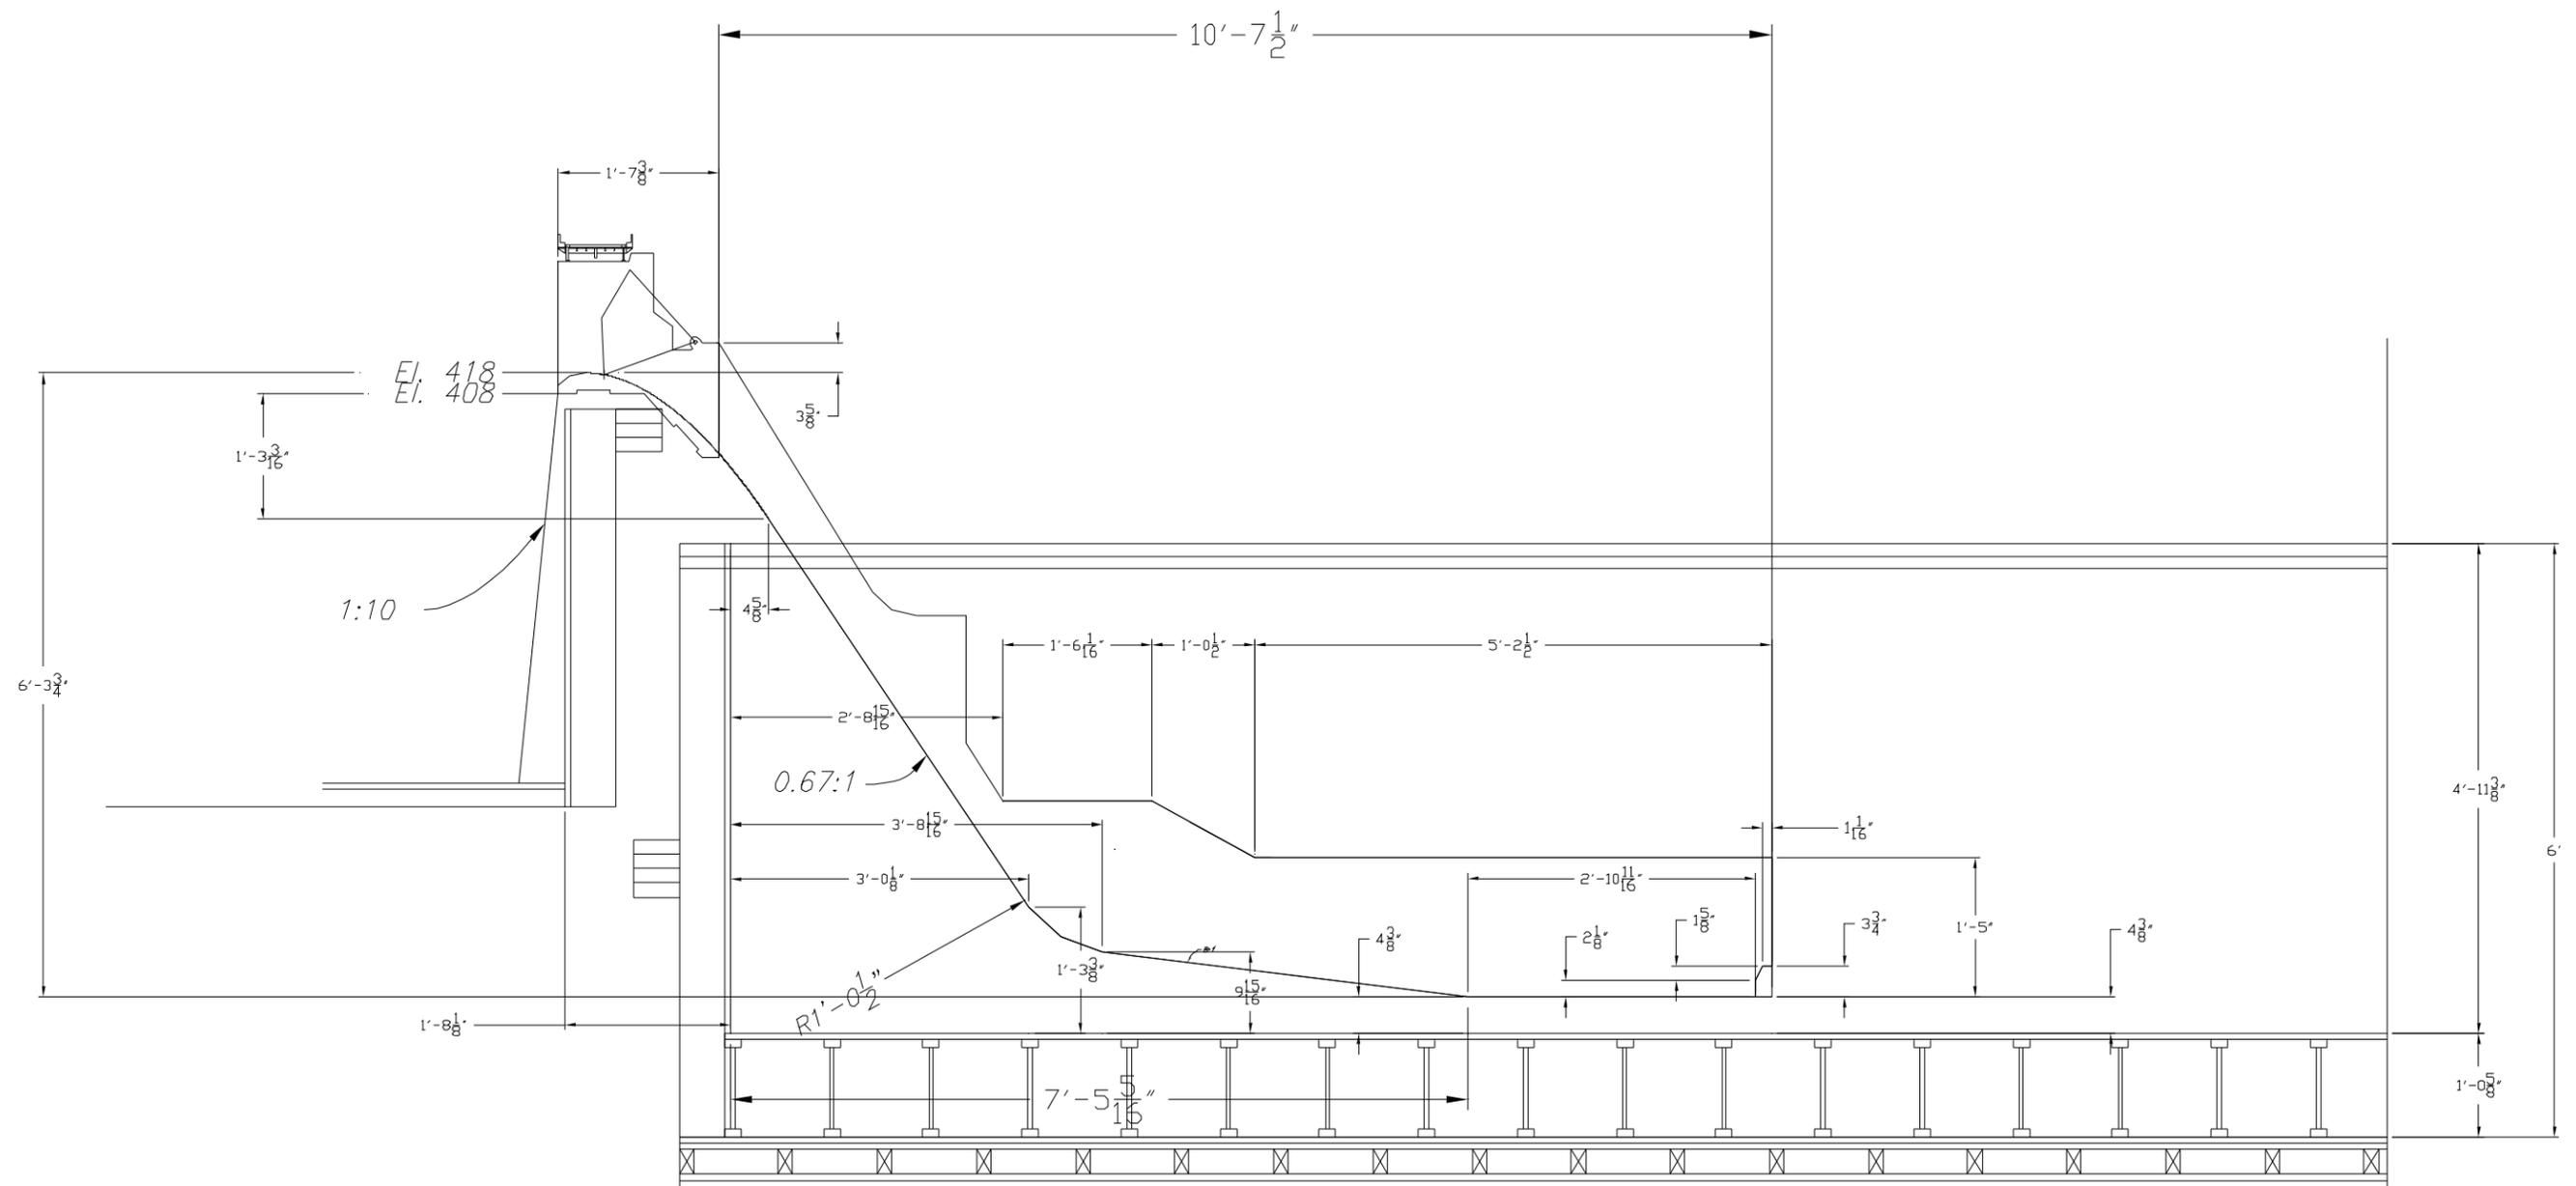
Model construction drawing: Cross-sectional profile view of main dam spillway and stilling basin.
